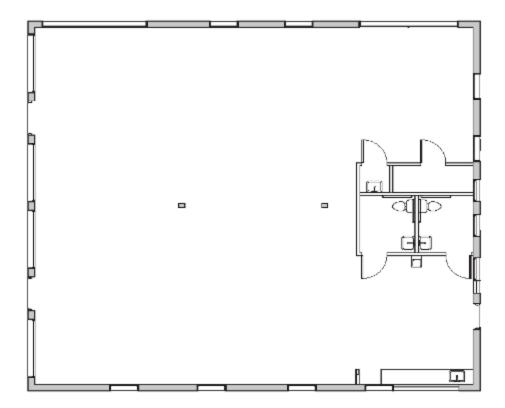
Existing Site Plan 2022 by Urbano Architects.
